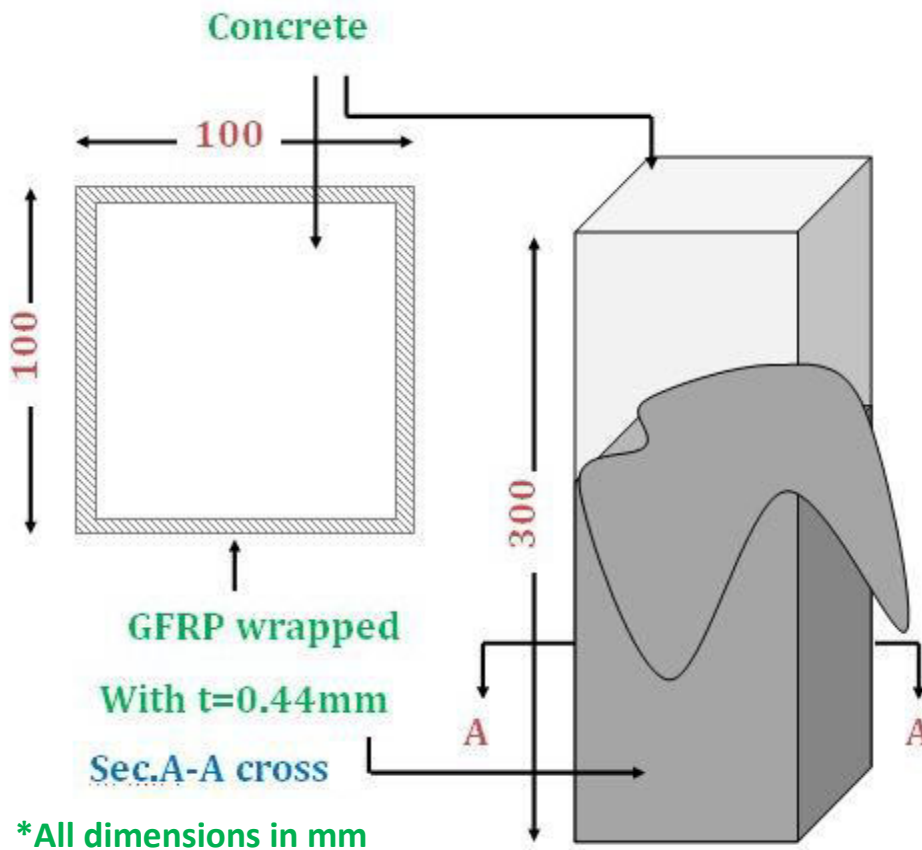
Details of (S1R1) Concrete Column (*Benzaid et al., 2008*).
